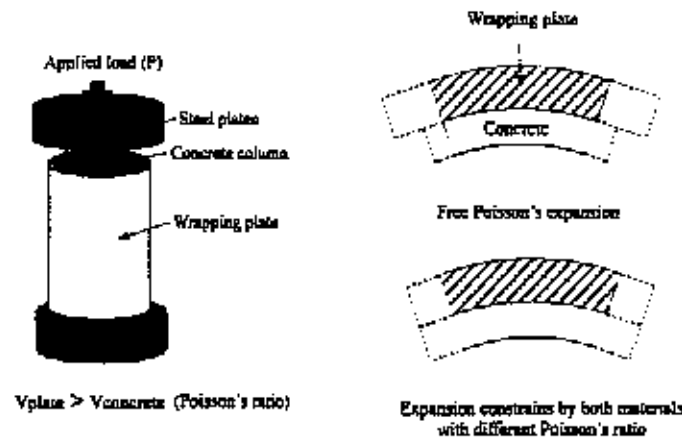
Poisson's effects of the wrapped concrete cylinder.
